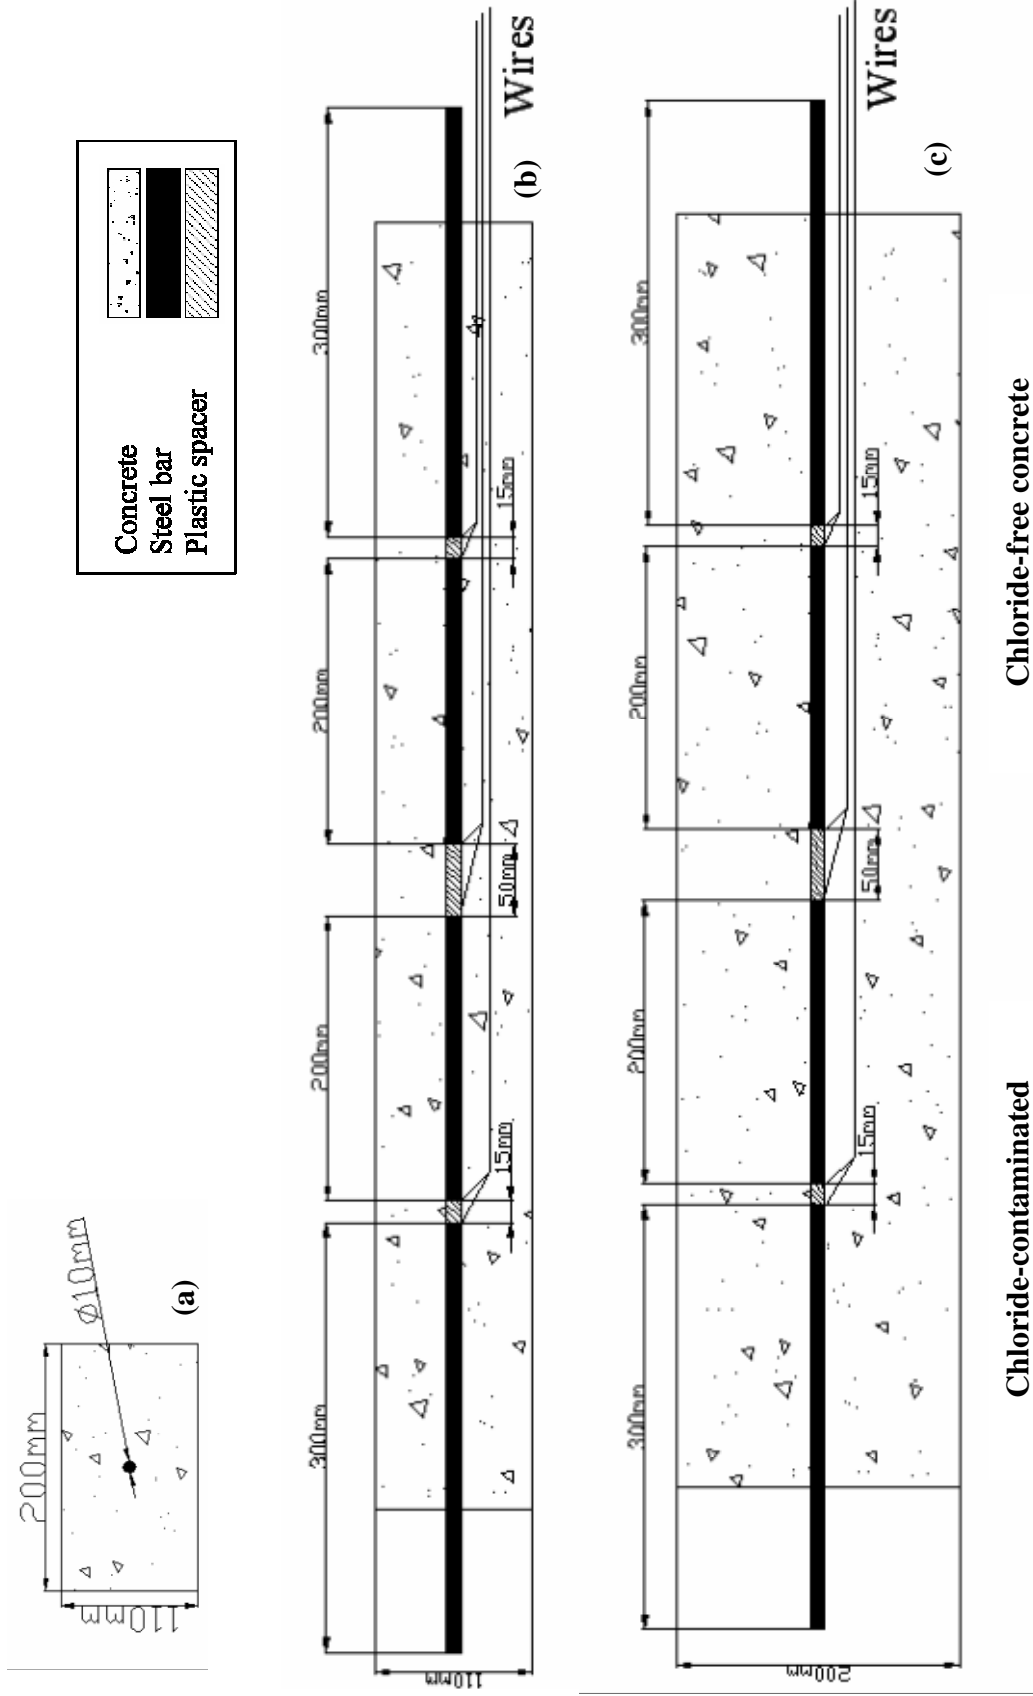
1 Schematic plan of a beam with segmented steel bar embedded in concrete (a) end view, (b) side view and (c) top view.
